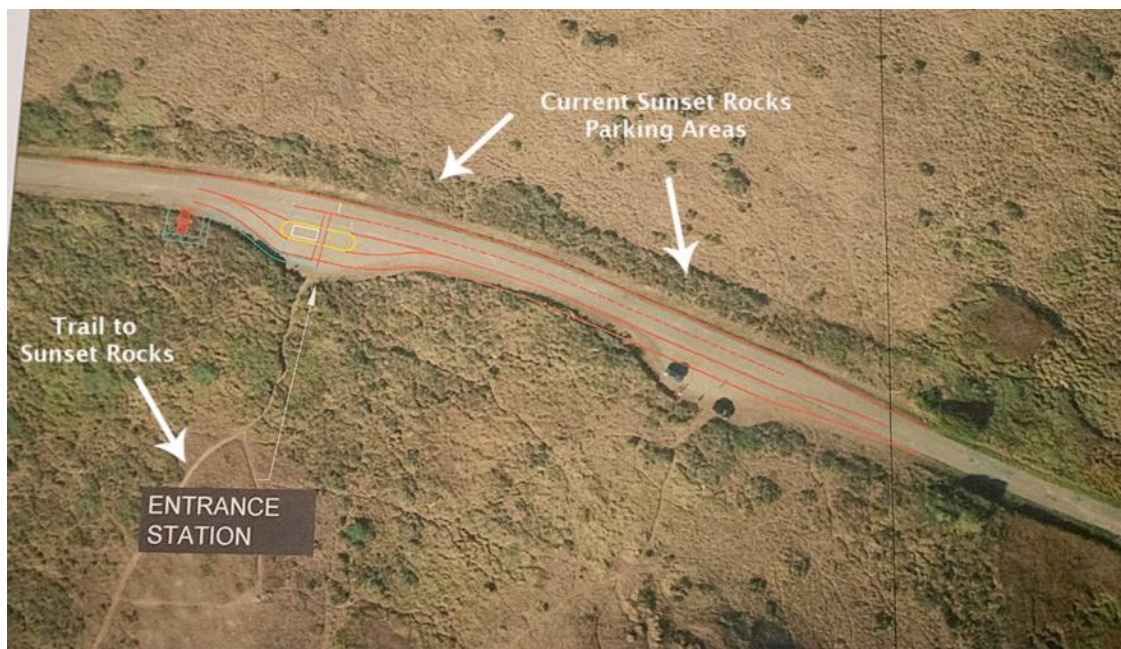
Overview of previously-proposed kiosk at Goat Rock Road, Sunset Rocks parking and access³
